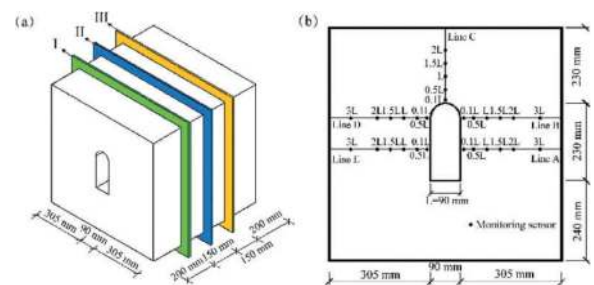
Layout of monitoring sections (a) and monitoring sensors (b) (Unit: mm). Section I: the radial stress monitoring section; Section II: the radial deformation monitoring section; Section III: the tangential stress monitoring section.
